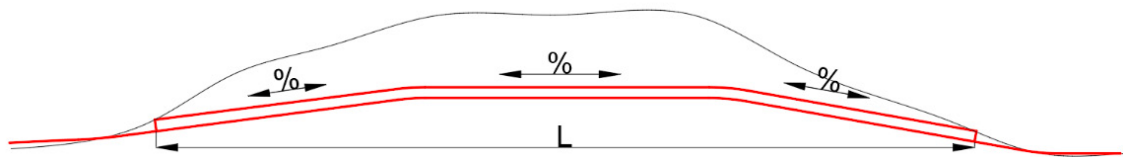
scheme of elevation profile of a long two-way two-lane rural road tunnel in impervious terrain.
